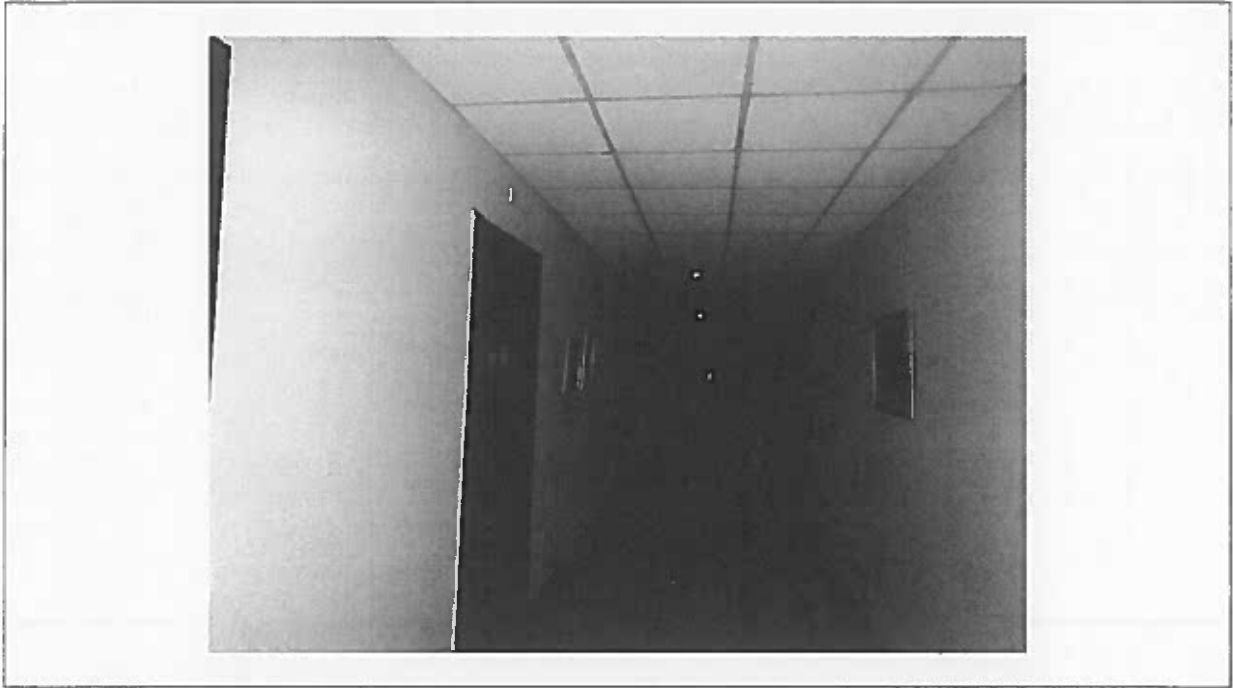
note existing state of hotel corridor with abutting doors to rear guest rooms.
